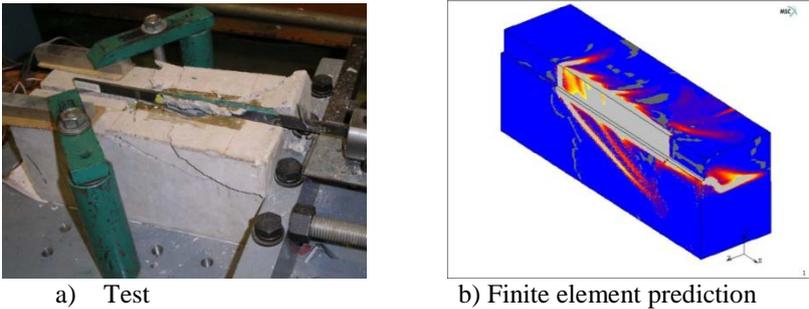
Crack pattern of NSM FRP-to-concrete bonded joint
